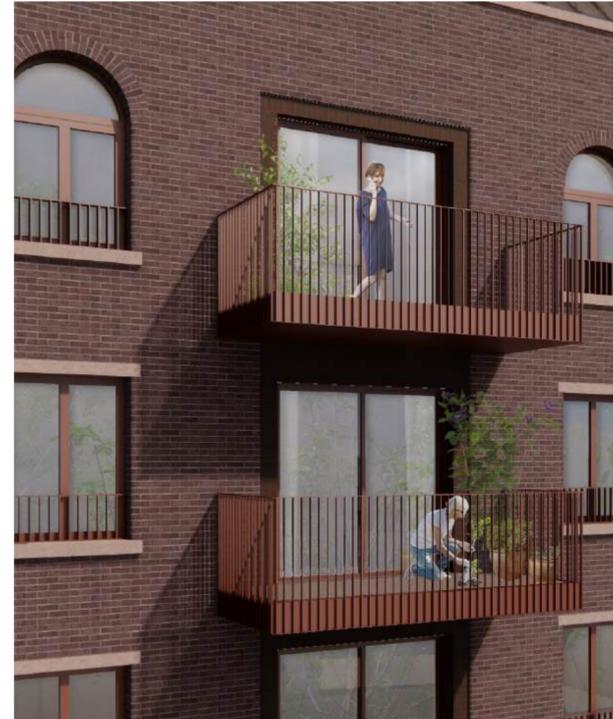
Example of open rail balcony expression on the Wharf Building
